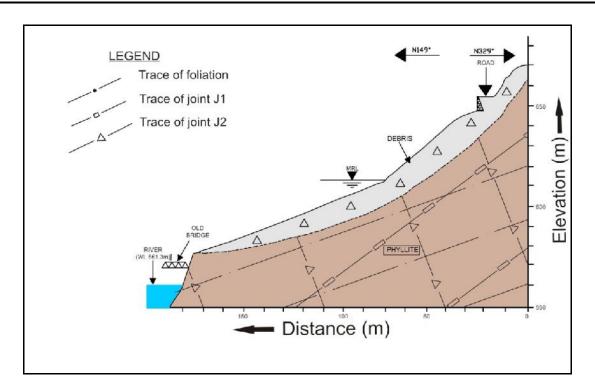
Geological Section of Slope RBS11 Located 7.2 km d/s of Zero Bridge (near Palam village u/s of Iron Bridge)
